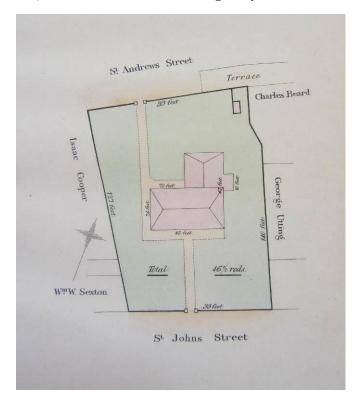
Site plan, from An Account of the Estates etc. belonging to Suffolk Quarterly Meeting, 1868
